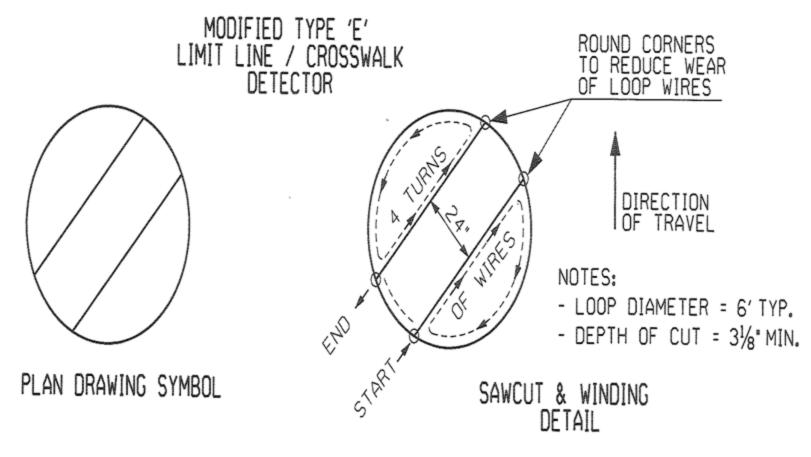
TYPE 'E' MODIFIED LOOP
